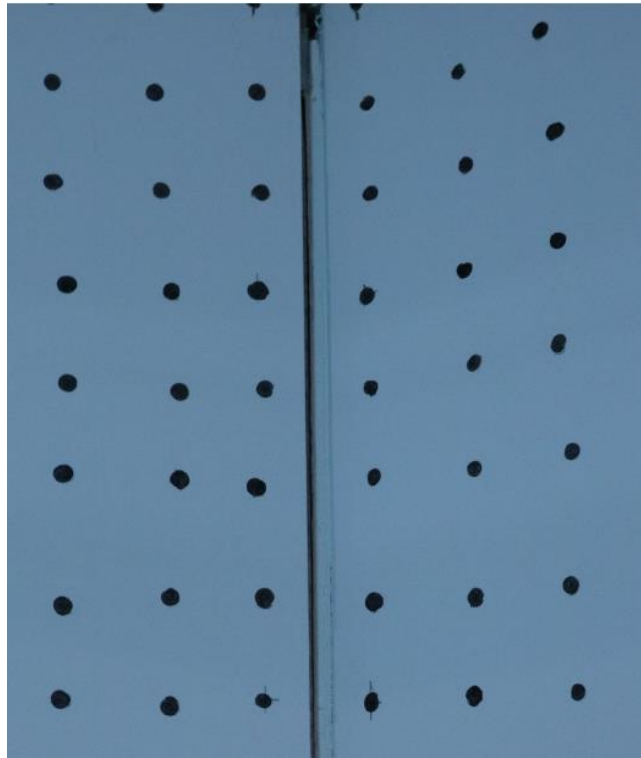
Specimen B2 – Step 14 – DS2b: Excessive gap size developing at wall ends – location 2
